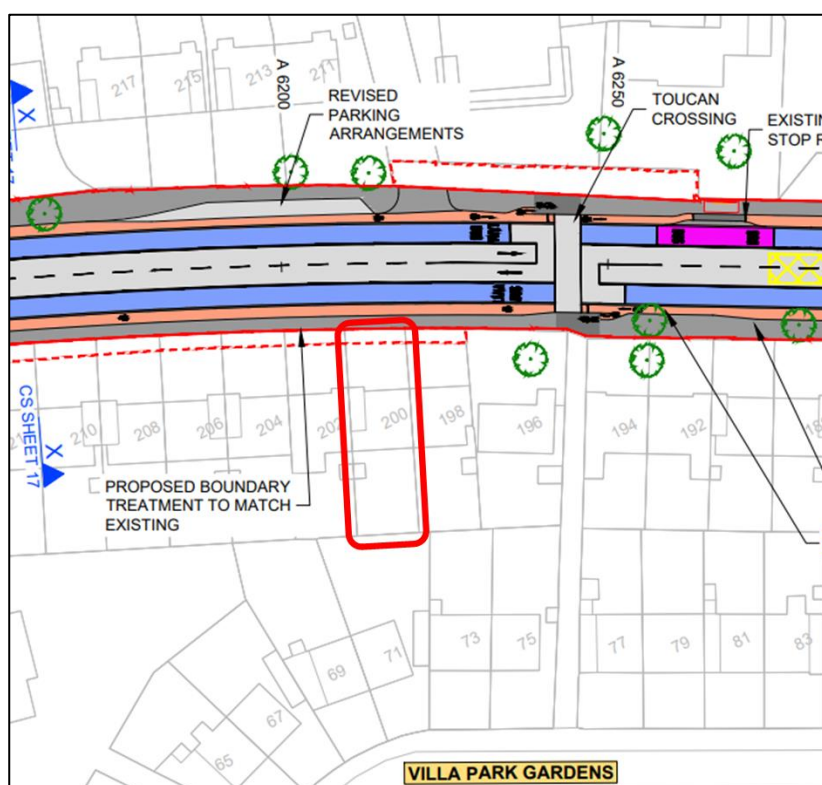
Proposed new Layout at 200 Navan Road
